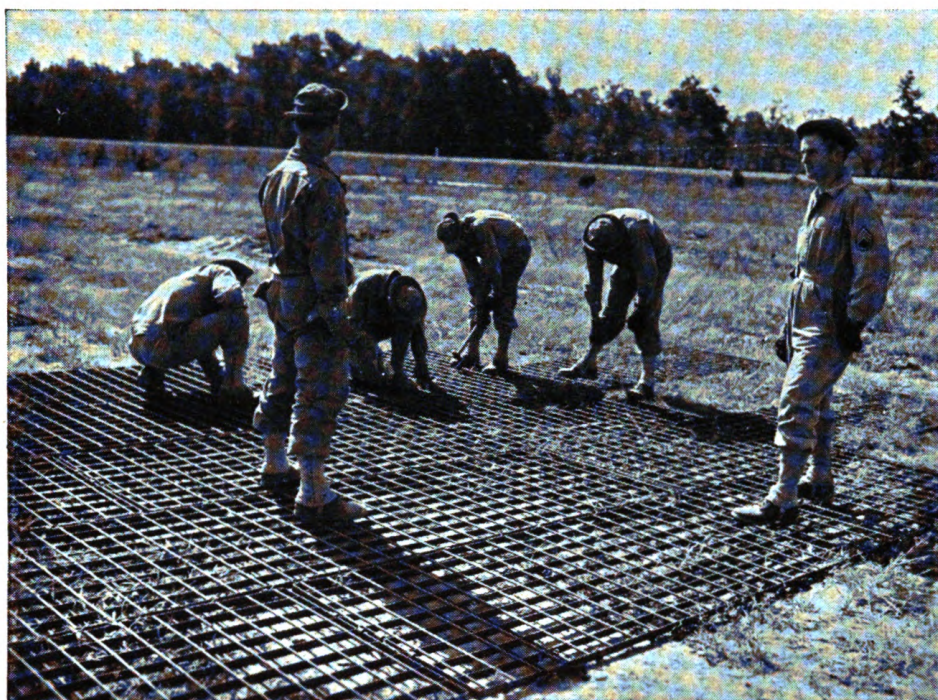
Laying and connecting bar-and-rod panels. Crimping crew will follow and complete connections.
